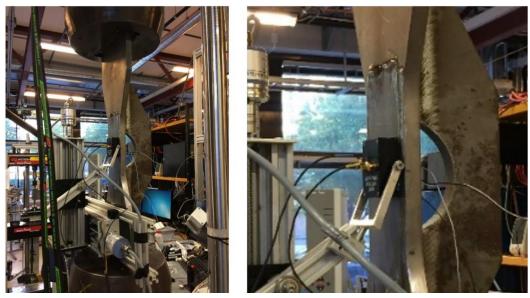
A rat-hole specimen with the TOFD equipment evaluating the fatigue crack development.
